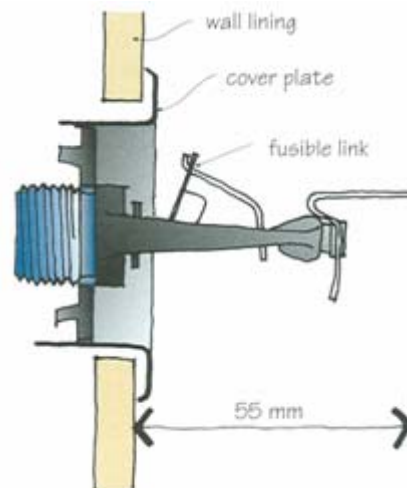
Typical sidewall sprinkler (Saunders and Conder 2002)
